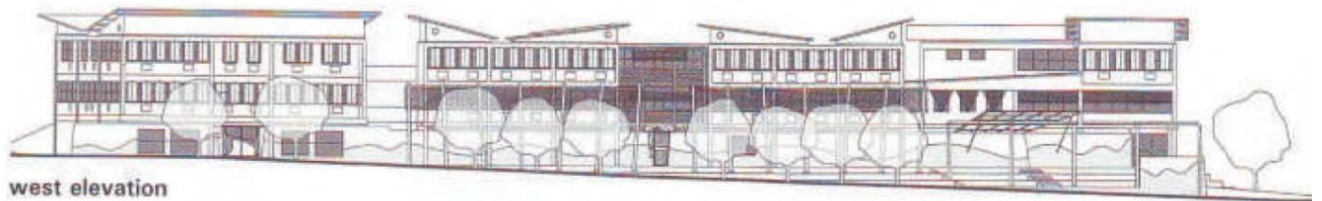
Street Elevation by East Coast Architects. (Source: Pillay, 2014)
